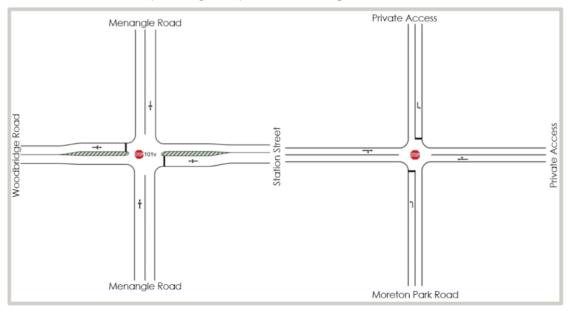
Adopted SIDRA Existing Intersection Layout
